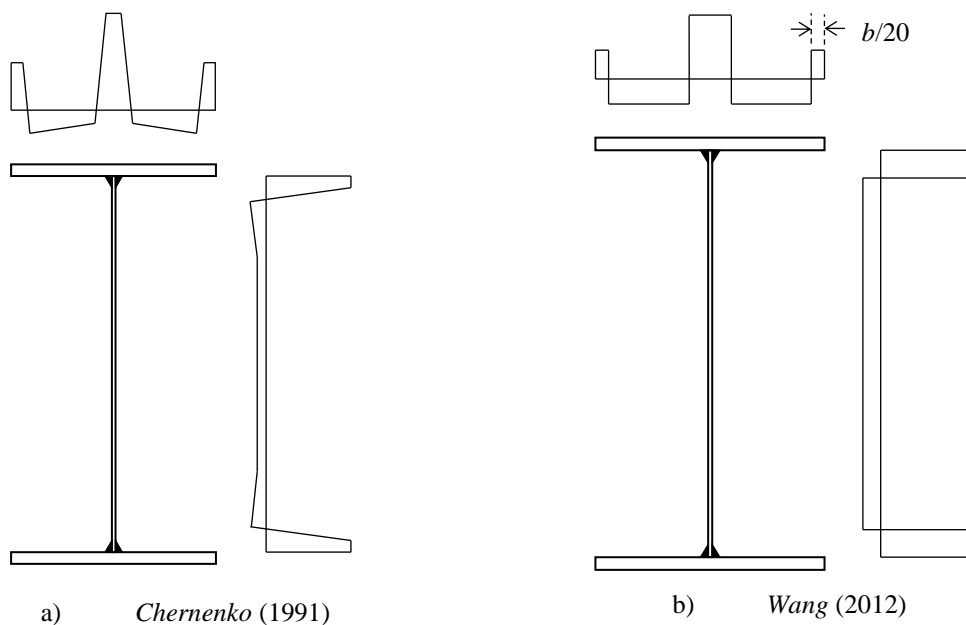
Residual stresses shapes for welded members with flame-cut flanges
